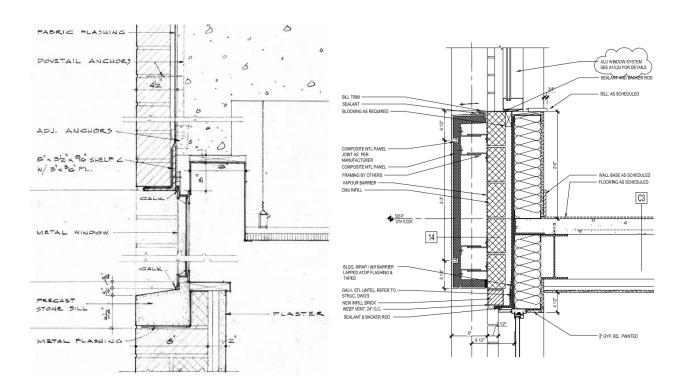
Section through typical exterior wall in existing building. From A.12: Window & Wall Sections
